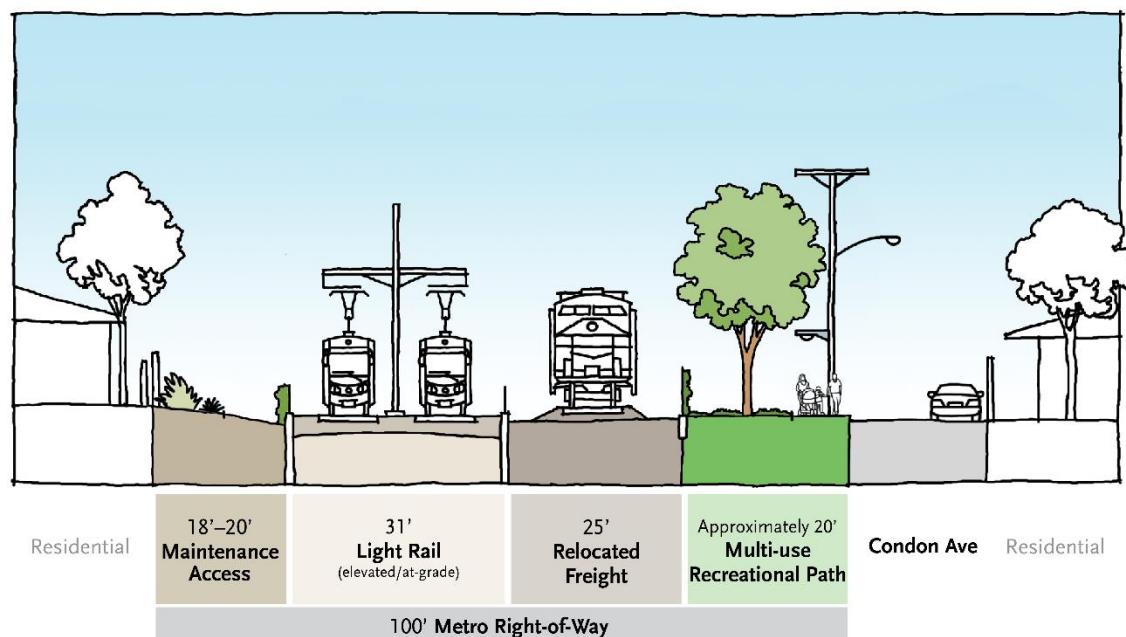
Proposed Project – Looking South of 162nd Street
